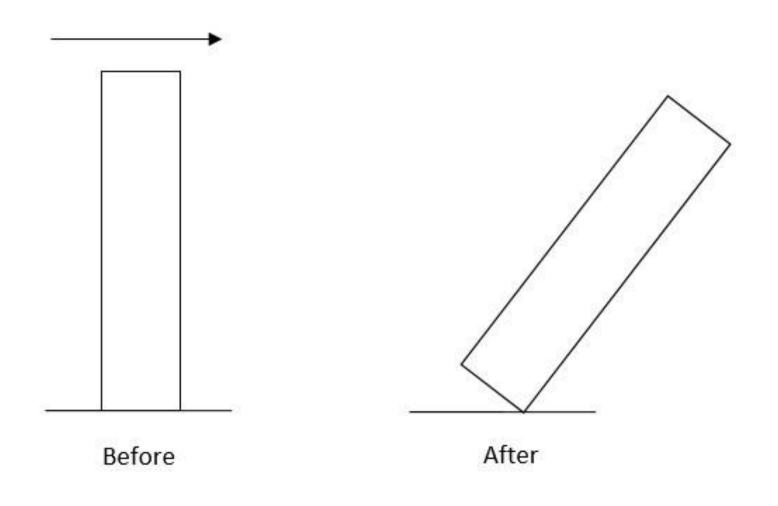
100 mm Unreinforced Masonry Wall Piers Failure Mode: Out-of-plane Toppling Instability Cause: Slenderness too high; bearing stress too low
